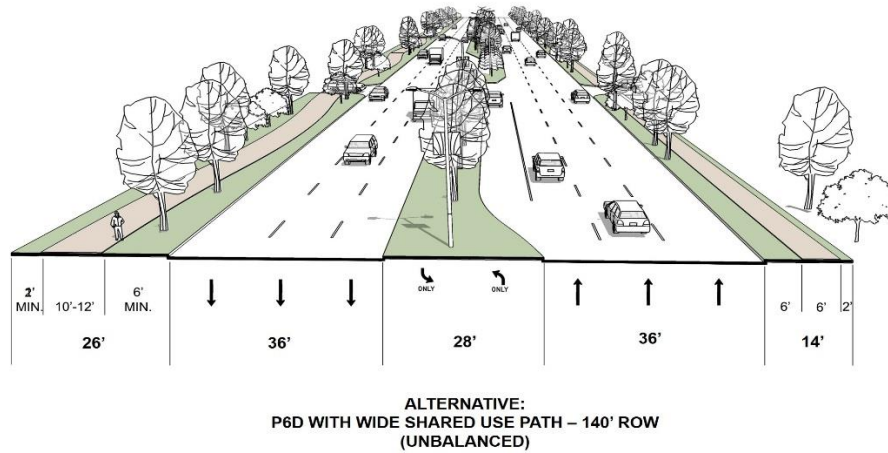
cont'd - Alternate Typical Sections using 140' Right of Way
